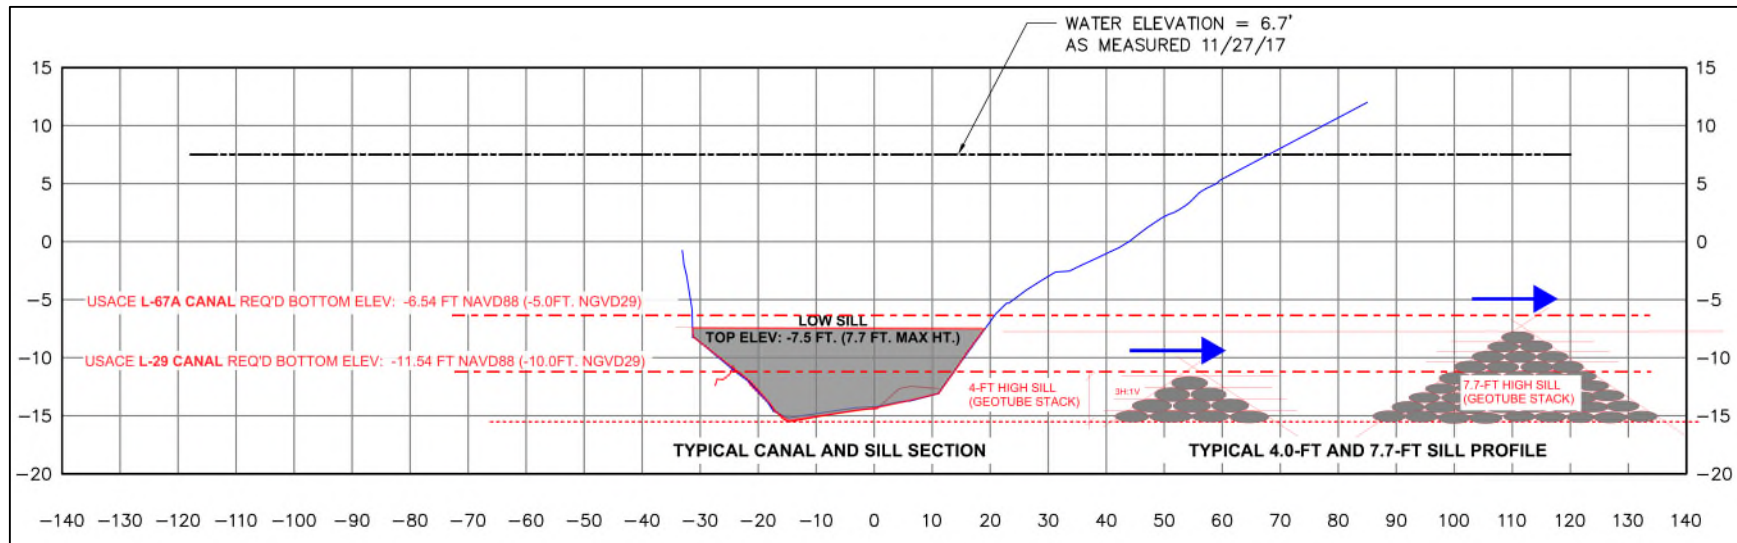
Typical canal cross-section and profile showing the low-sill weir (GeoTubes).
